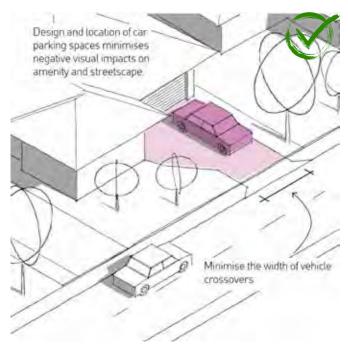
Single House and Grouped Dwellings - Setback of Garages and Carports Example Diagram
